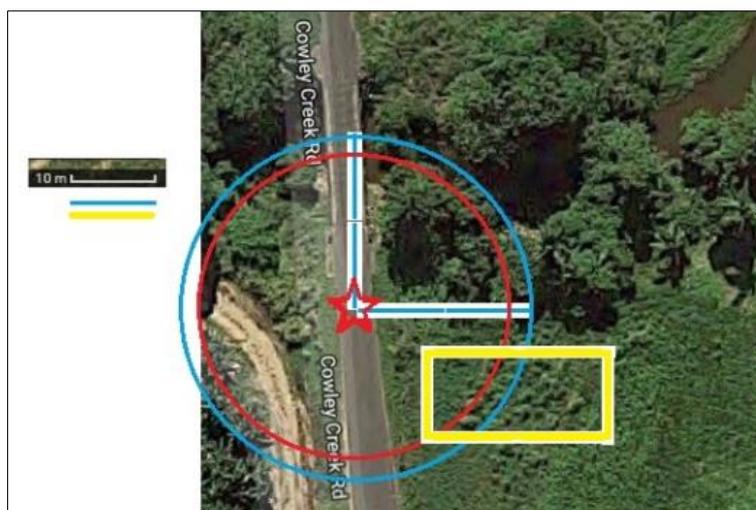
Cowley Creek Road Bridge staging area and single lift radii with the 250T All Terrain Crane.
